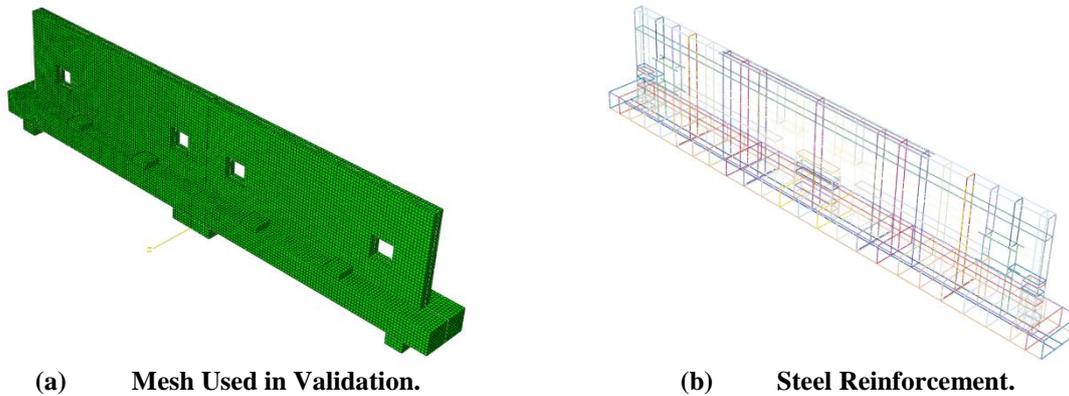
Detailing of Bottom Loaded Continuous Deep Beams with Web Openings at the Center
